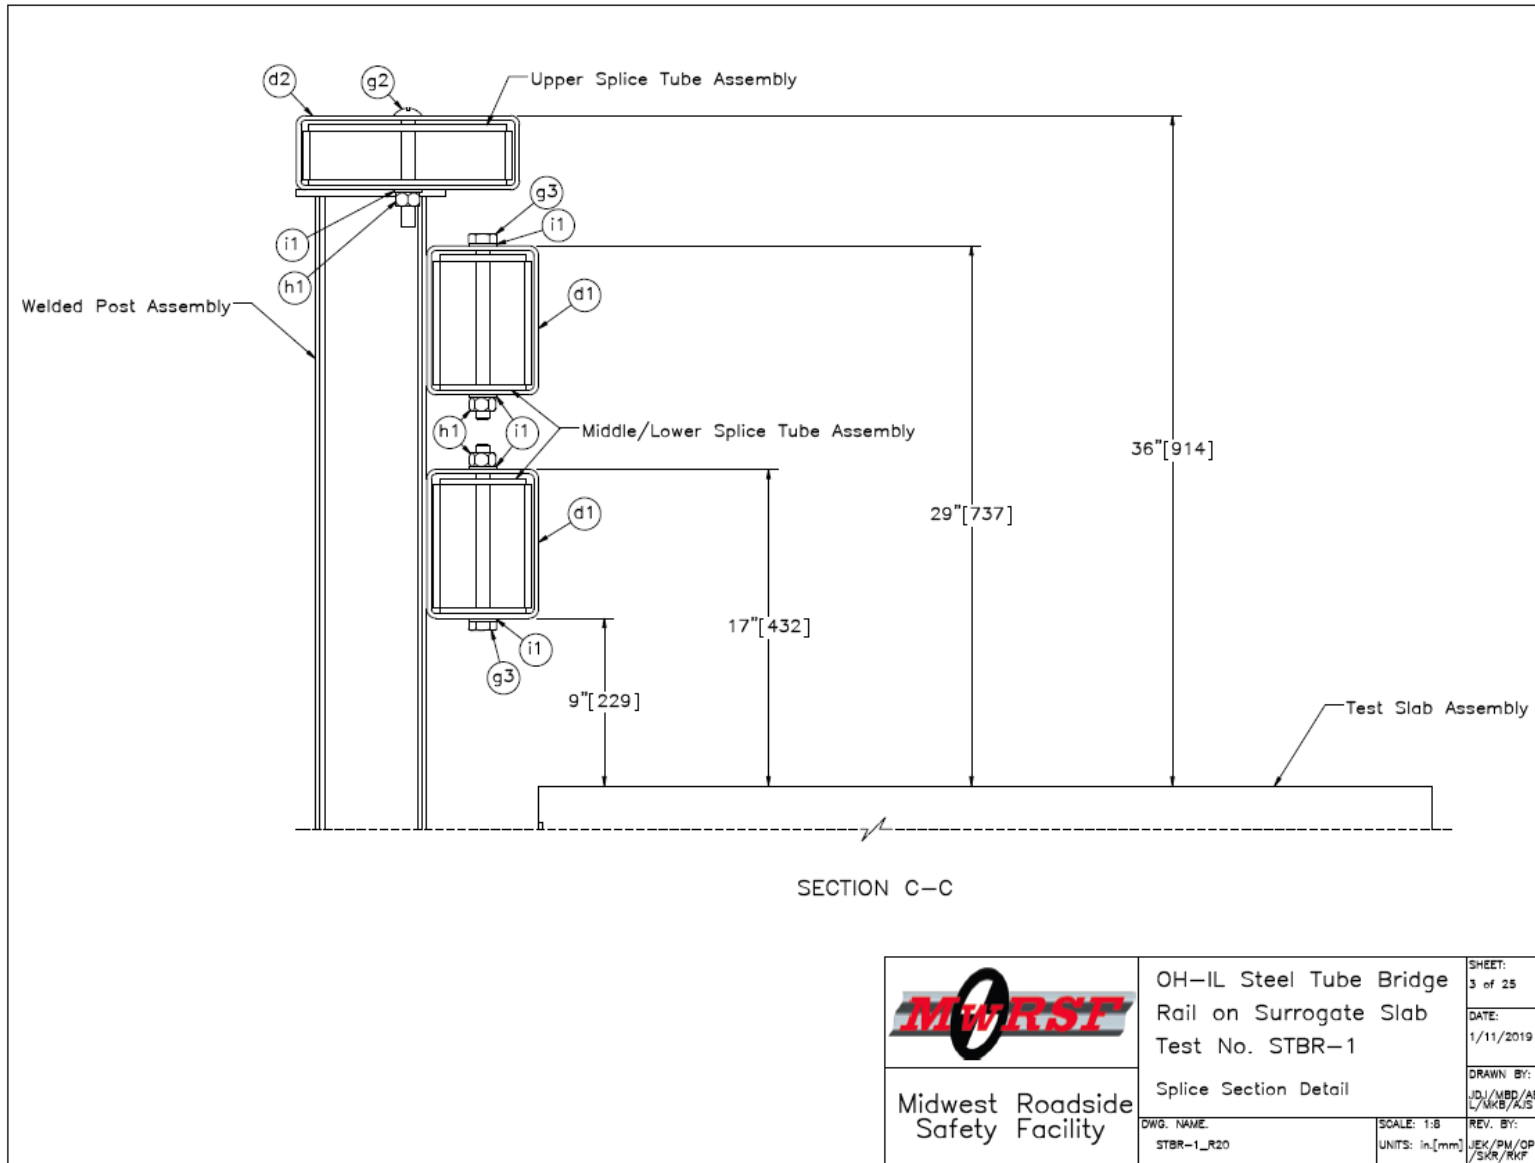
Rail and Post Attachment Section Detail, Test No. STBR-1
